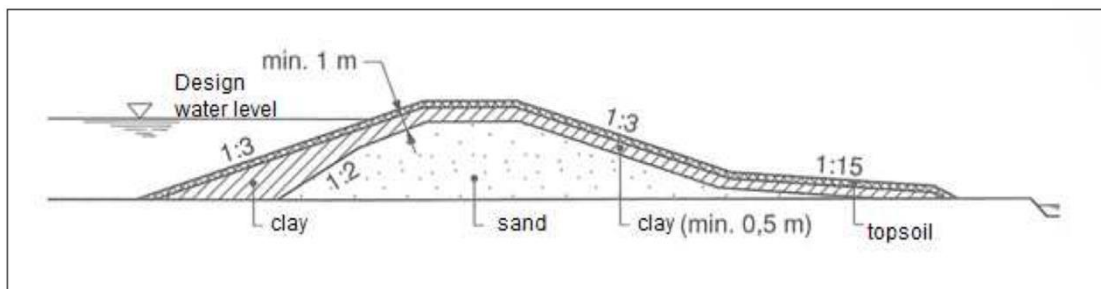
Typical river dike cross-section (Jonkman, 2014)
